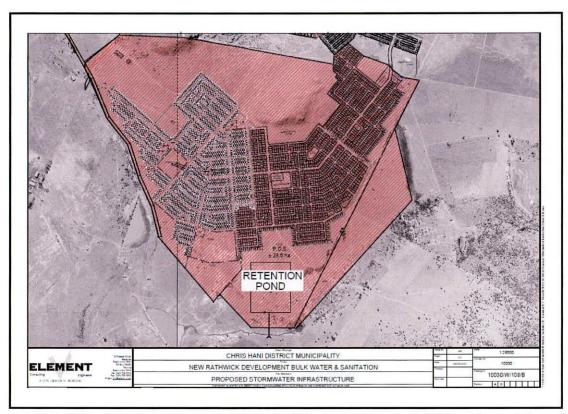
Rathwick bulk services – proposed stormwater infrastructure (courtesy BESC and Element Consulting)
